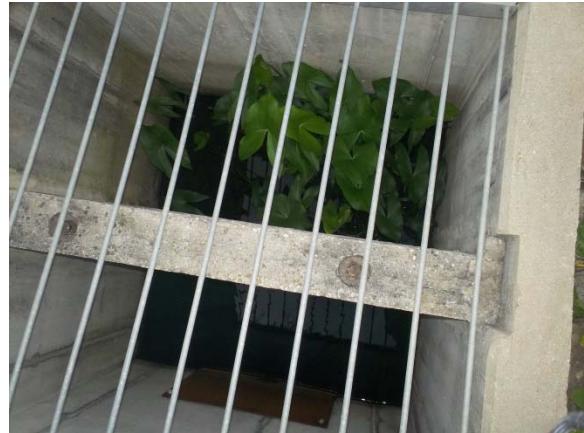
Top View of Outlet Structure (Note: Tree Growth in the Interior of the Structure)
